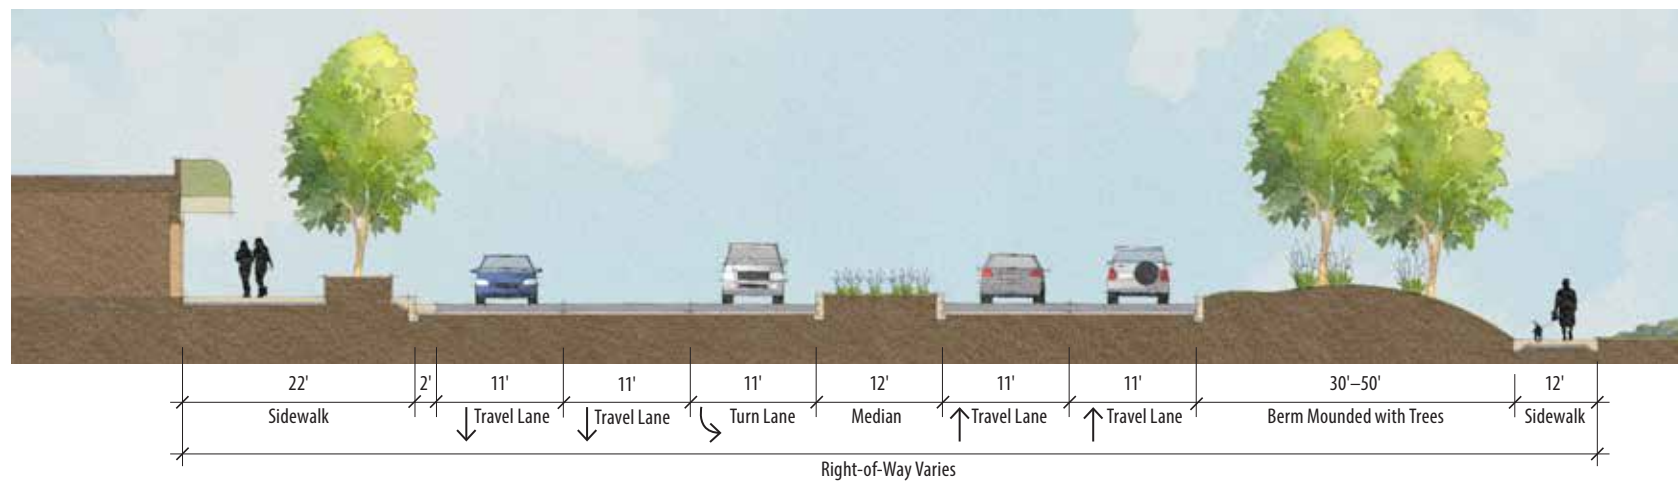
BASS LAKE ROAD EXISTING STREET SECTION Dated streetscapes and disconnected park sidewalk contribute to a pedestrian-unfriendly street.
